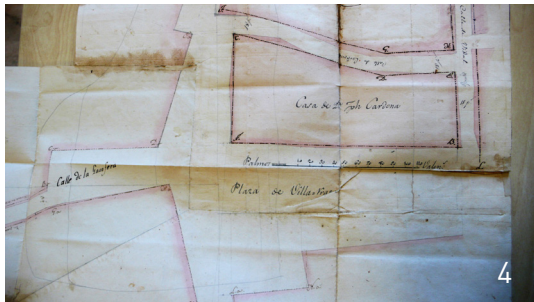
Vicente Cazador: "Geometric plan of the palace of Cardona and adjoining streets". 1814. Detail. AHMV. Photo: C. López González
